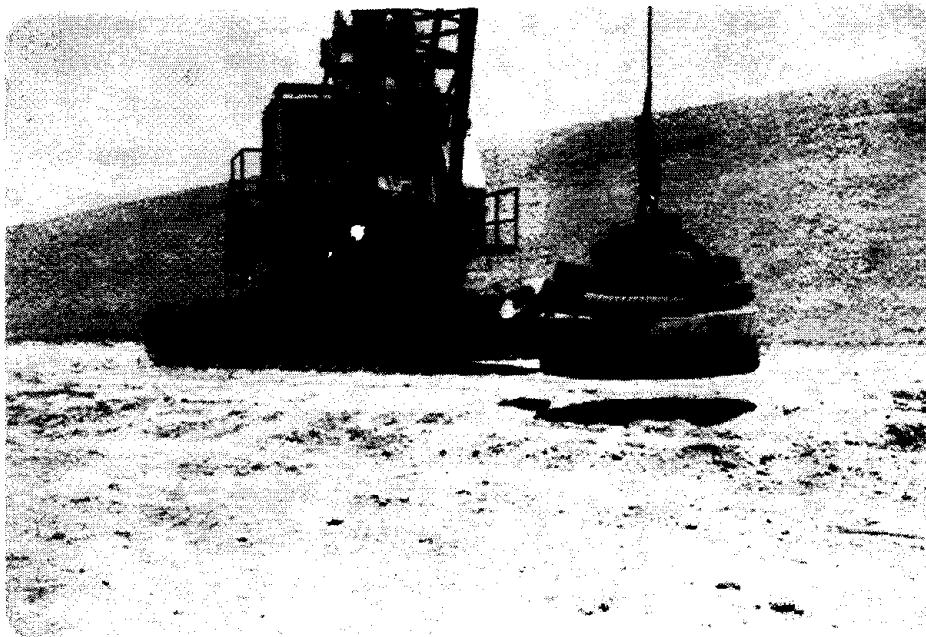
Rubber tires mounted on top of steel tamper to protect cable and clamping mechanism
